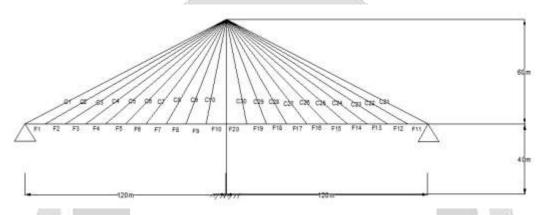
Typical Geometry of Cable-stayed Bridge
